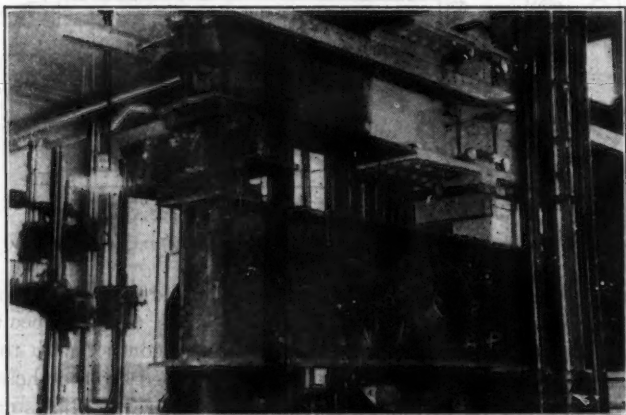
SPECIMEN 16, SHOWING POSITION OF THE SEVERAL DIALS AND METHOD OF BRACING A SPECIMEN AGAINST BUCKLING.
